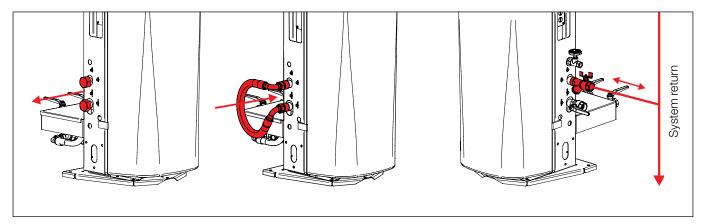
Connection of the connections to the bypass set and connection to the system return
